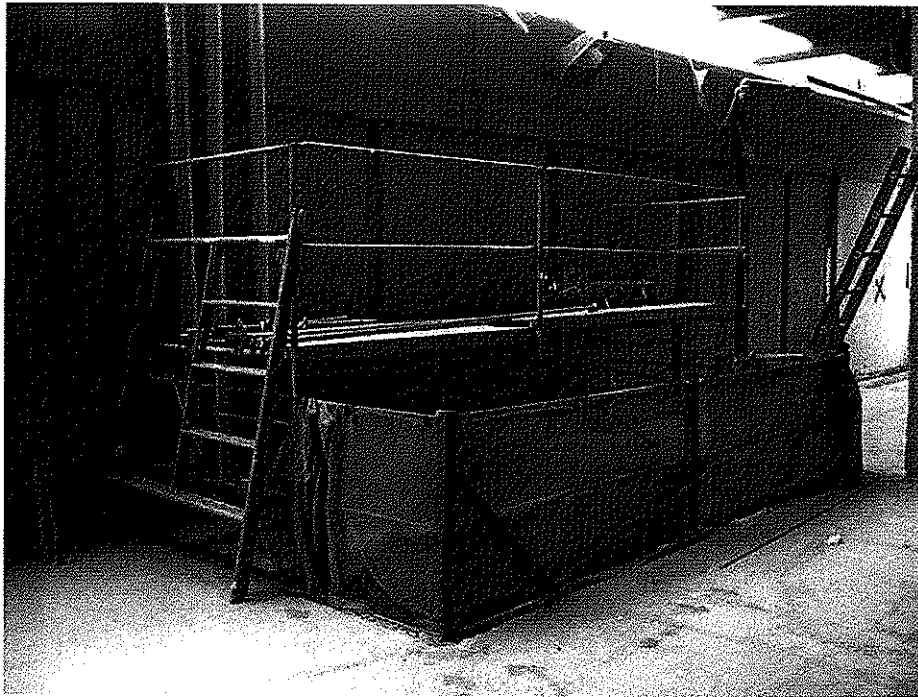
SCAFFOLDING OVER OPENING IN FLOOR EAST WALL (NORTH SECTION)
